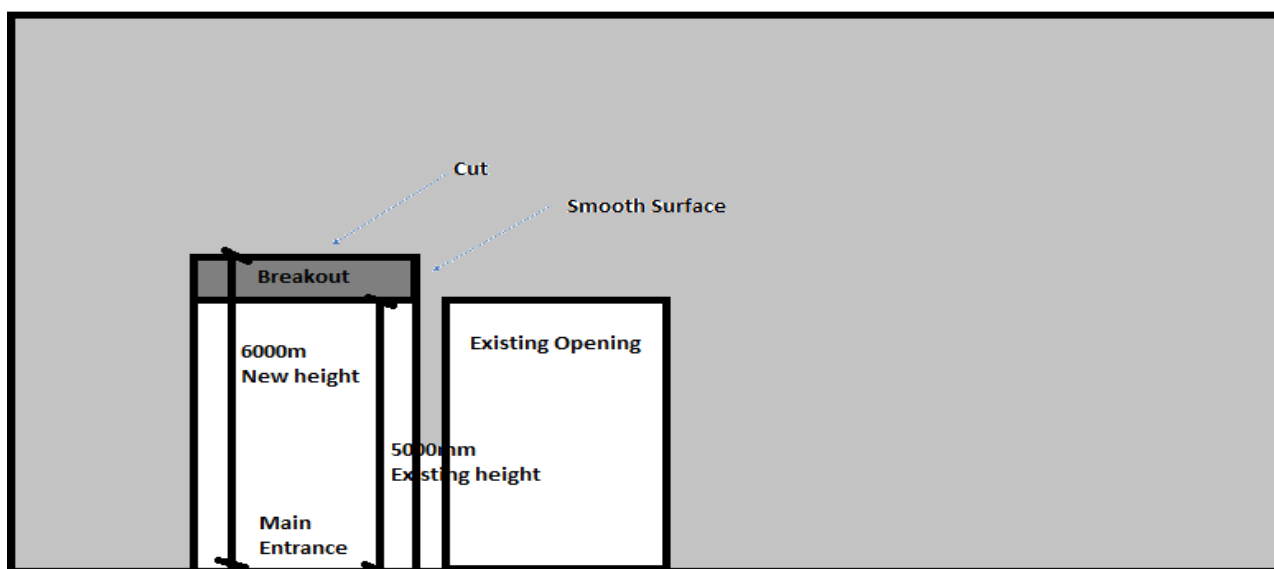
Marking out of the LLW Building Outer Wall (Gridline D1)
